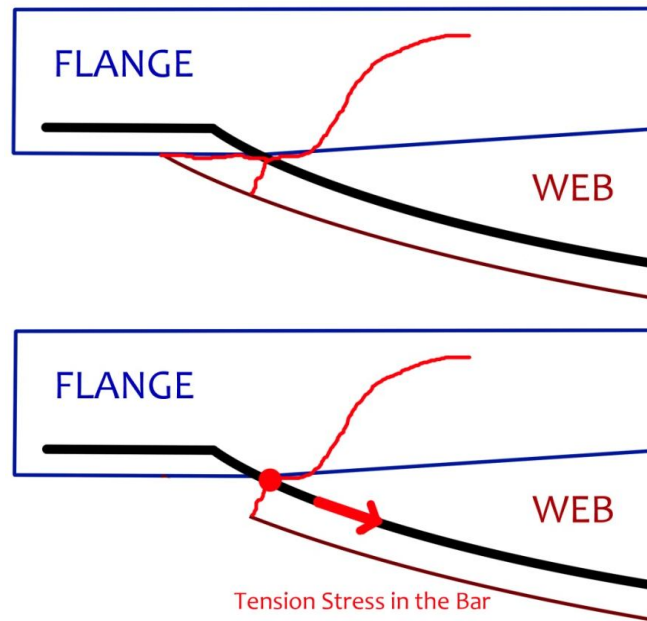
After the horizontal crack is fully developed the flange section loses stiffness and becomes more prone to the shear failure
